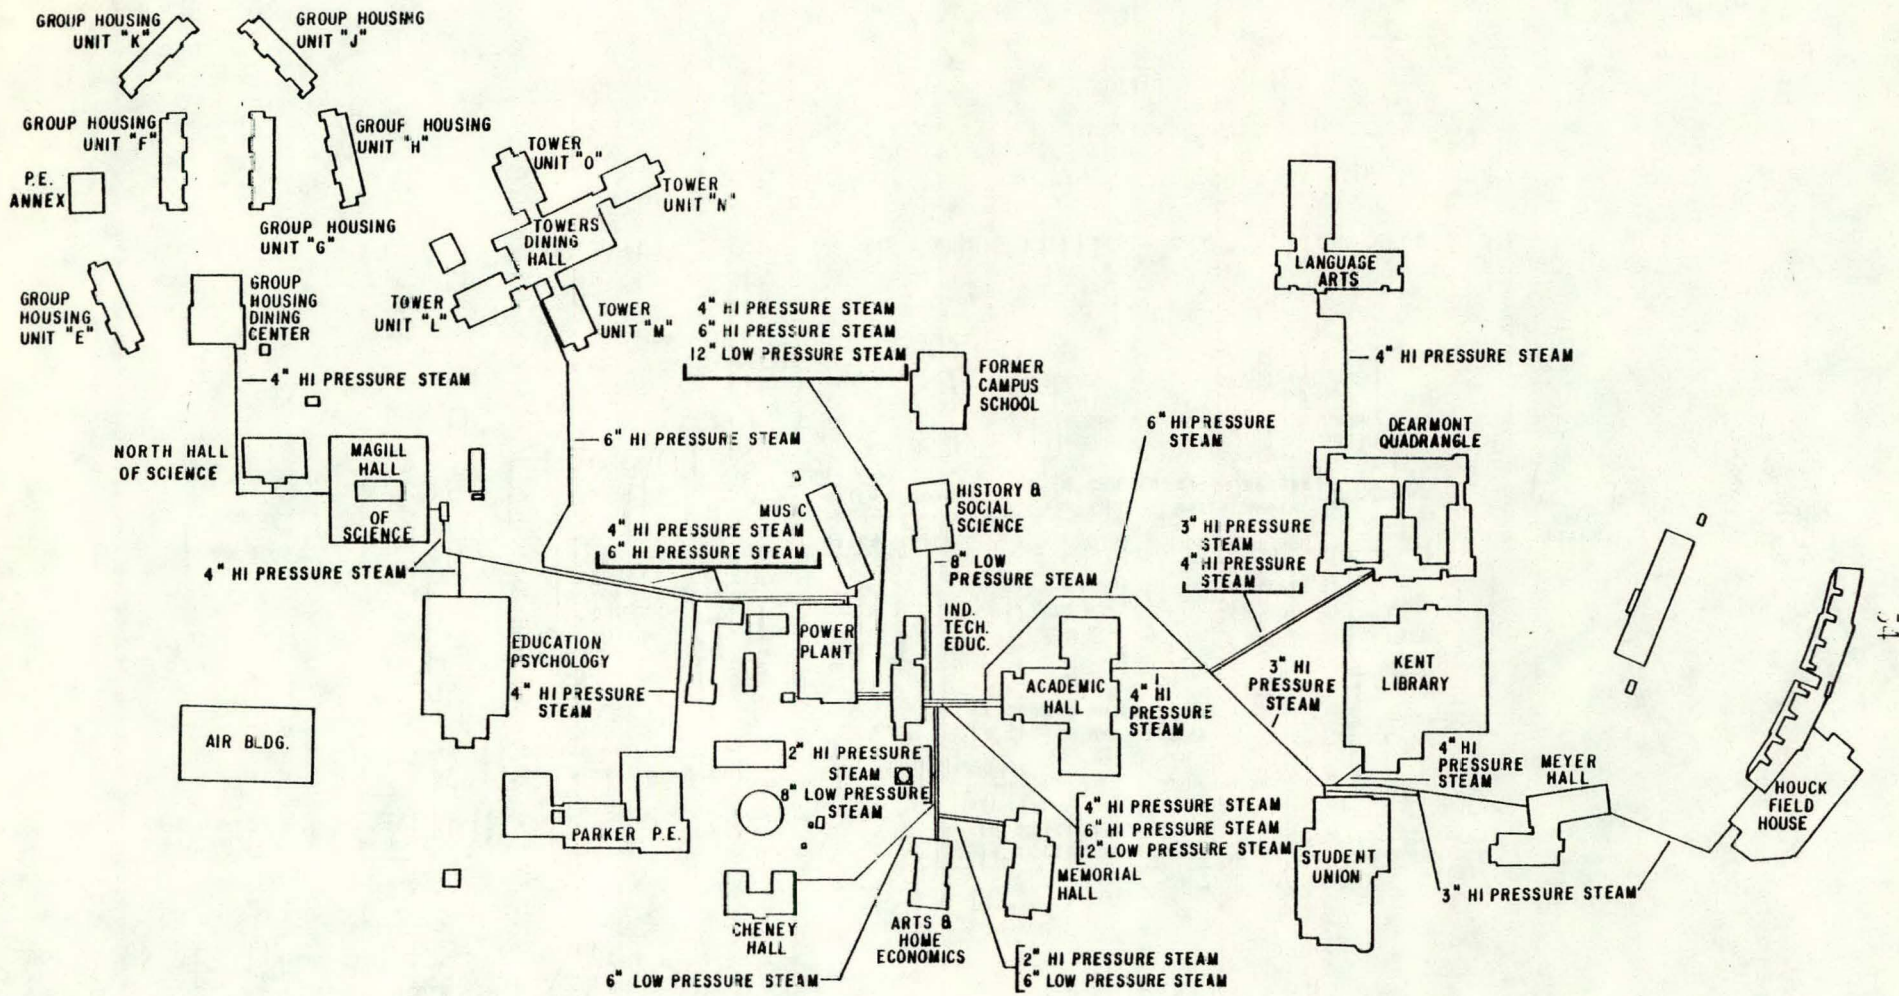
Southeast Missouri State Campus Steam System Site Plan
